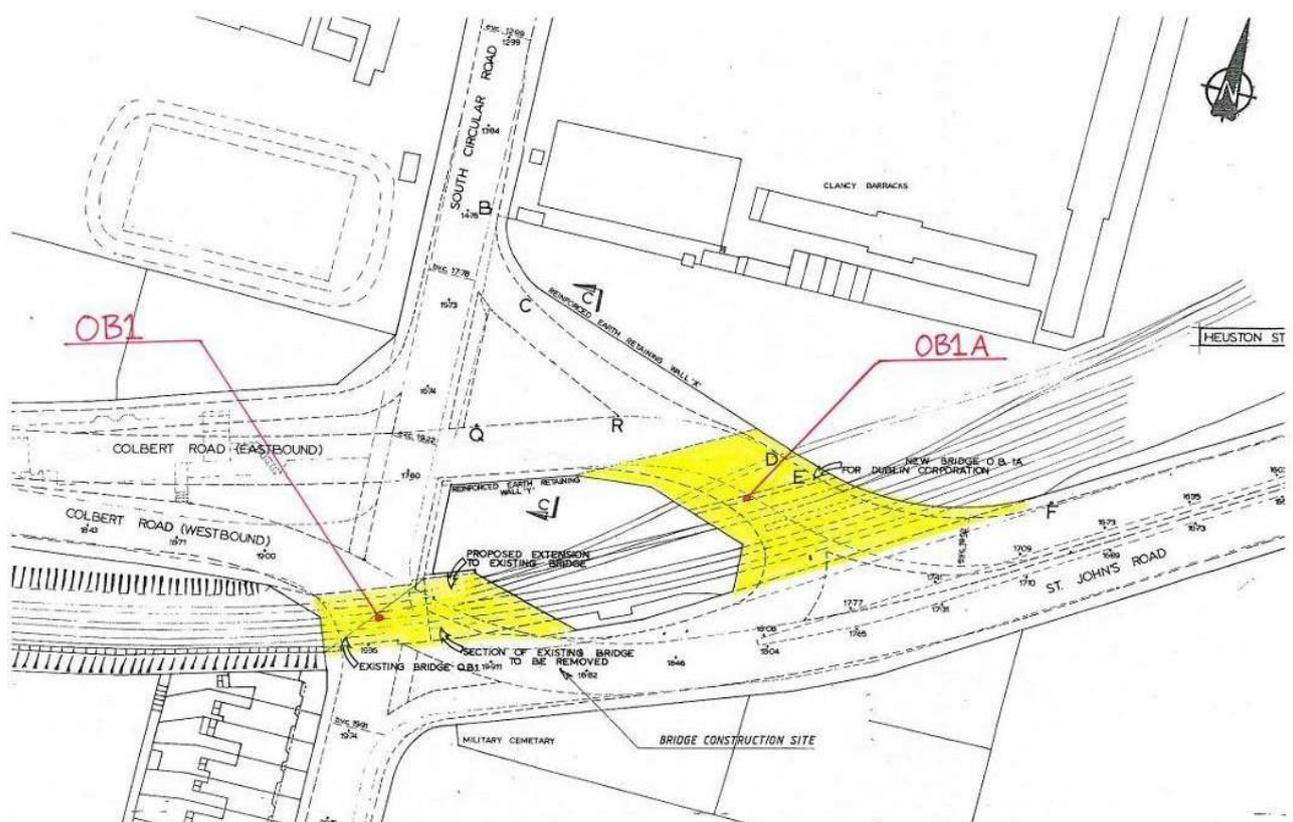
Plan of Rail Overbridges OB1 and OB1A at Islandbridge
